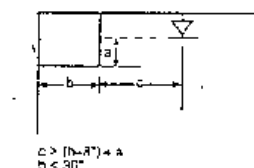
Horizontal obstructions against walls.
